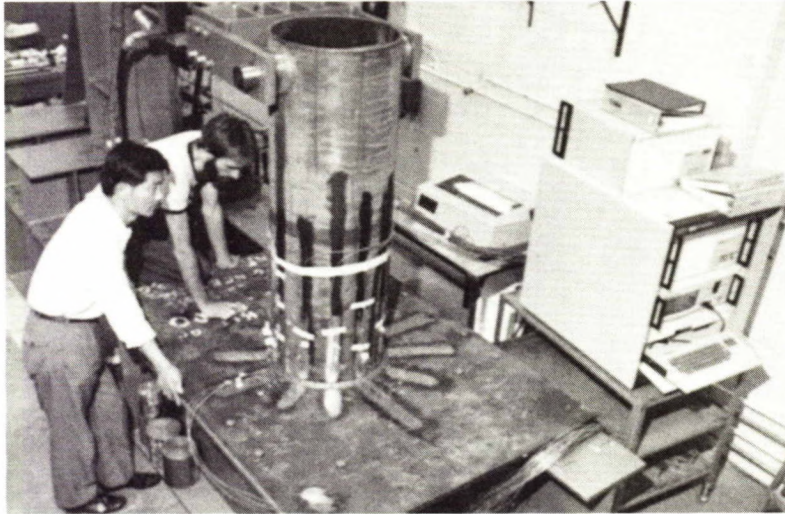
View of pipe-to-plate assembly being prepared for fatigue testing. (Courtesy University of Waterloo).
